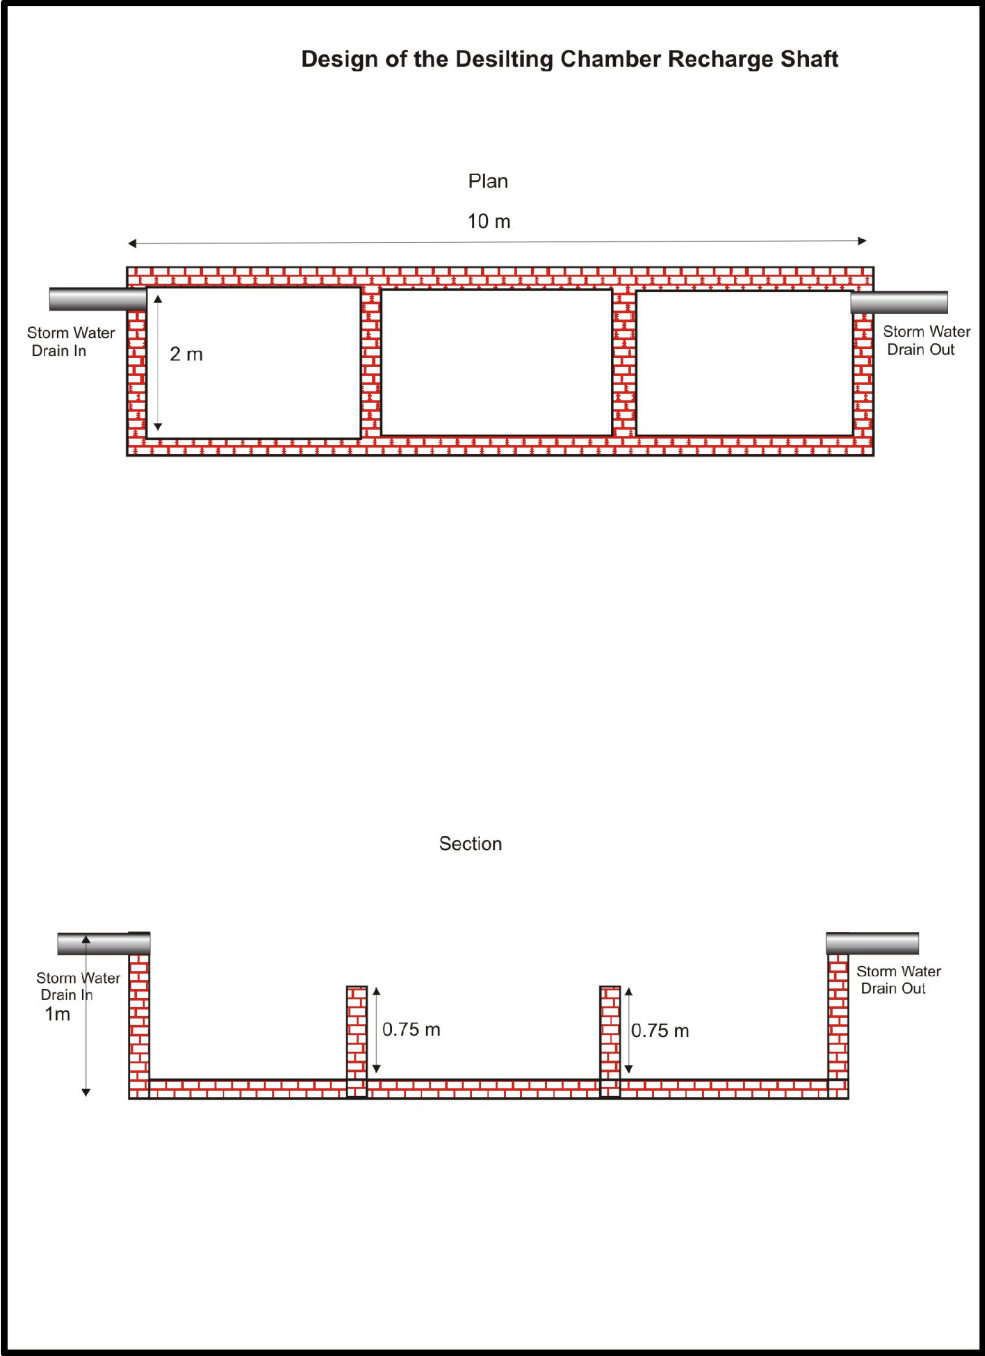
Design of de-silting Chamber for Recharge Shaft
